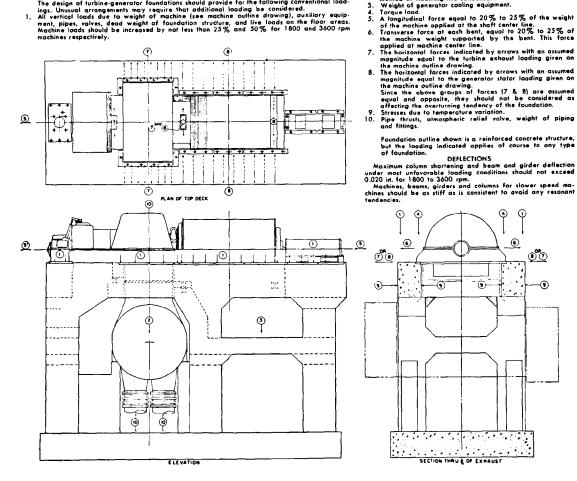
Massive concrete foundations carry the large static and dynamic loads of the turbogenerators independent of the powerhouse structure. Their design was based on this typical General Electric foundation loading diagram.
